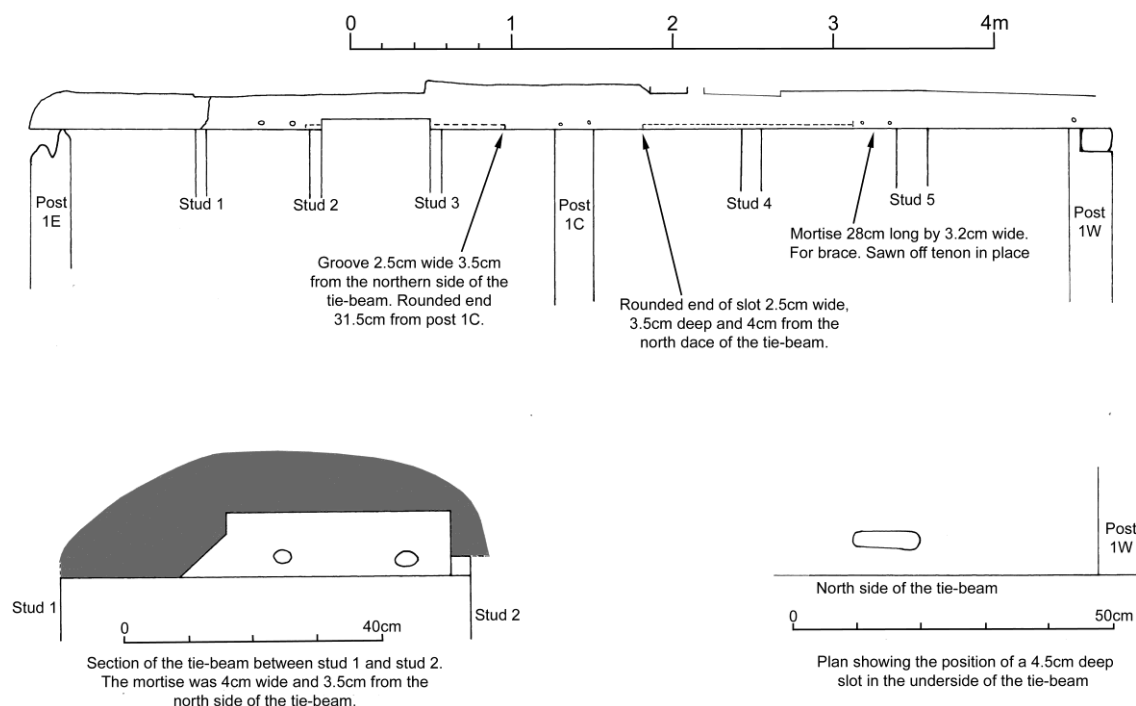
Details of the underside of the truss 1 tie-beam of truss.
